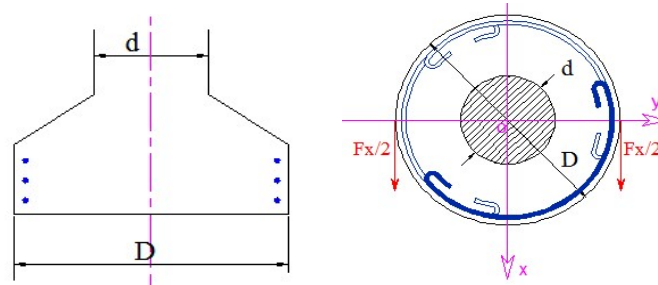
Distribution of reinforcement in circular footings arranged in hoops
